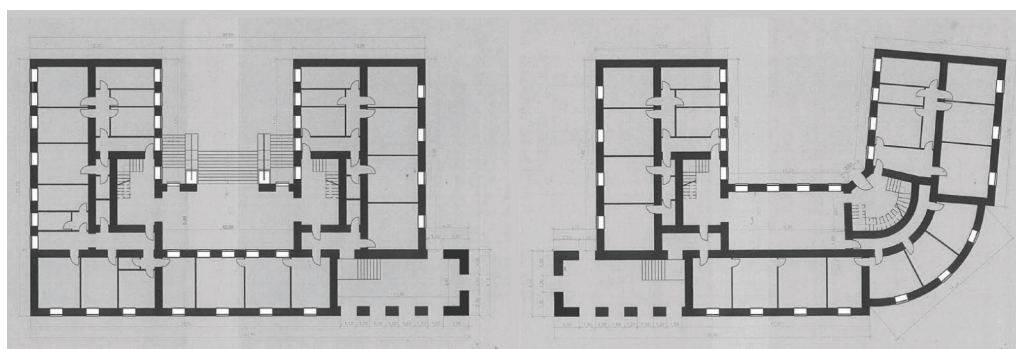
Survey drawing of the ground floor plan of the INCIS buildings on Viale Marconi, second lot: (authors' drawing).
